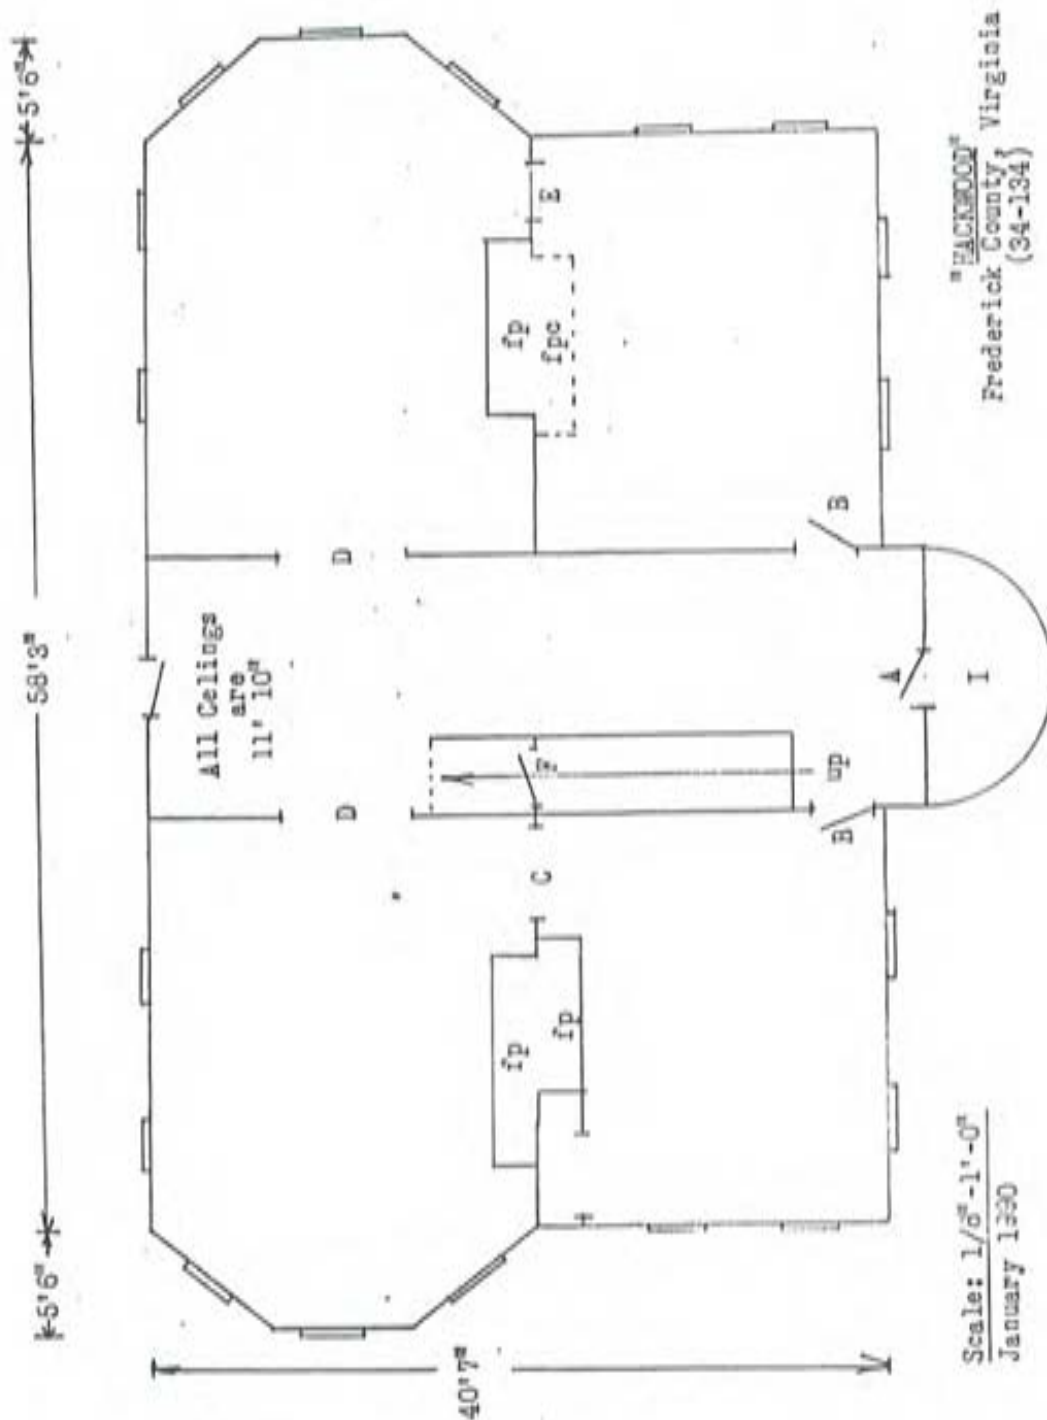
Floor Plan of Hackwood 34-134 (John Lewis, 1990)
